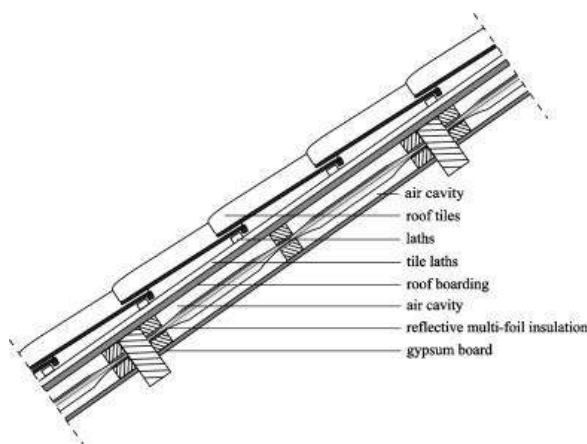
Example of a roof construction with reflective multi-foil insulation (Tenpierik & Hasselaar, 2013).
